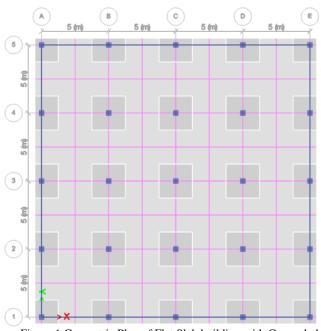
Geometric Plan of Flat Slab building with Concealed Beam and Drop Panels
